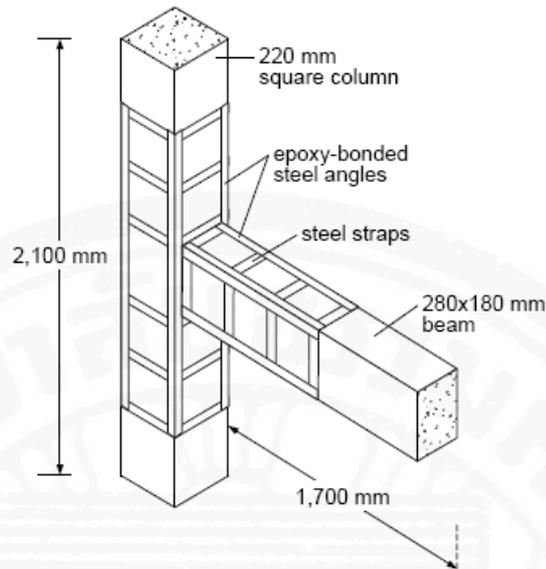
Typical exterior joint strengthened with a steel skeleton by Migliacci et al (1983).
